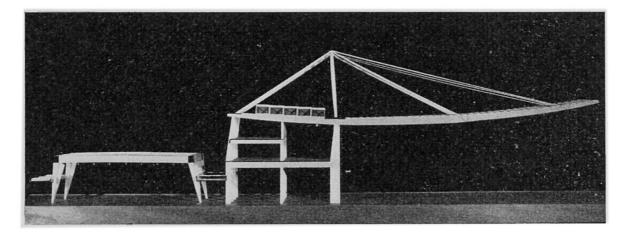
Fiumicino hangar. Longitudinal section of the roof (designed by R. Morandi).
